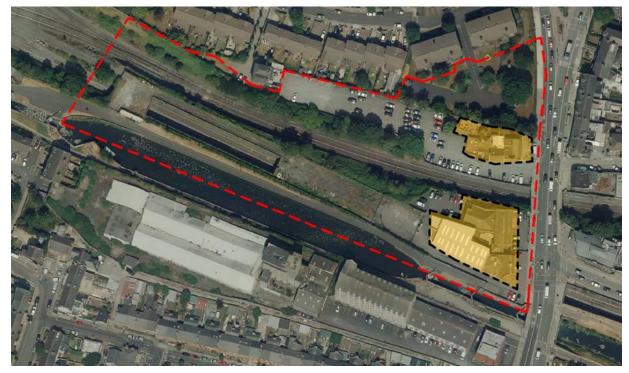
Plan Showing Properties to be Demolished and Site Area
